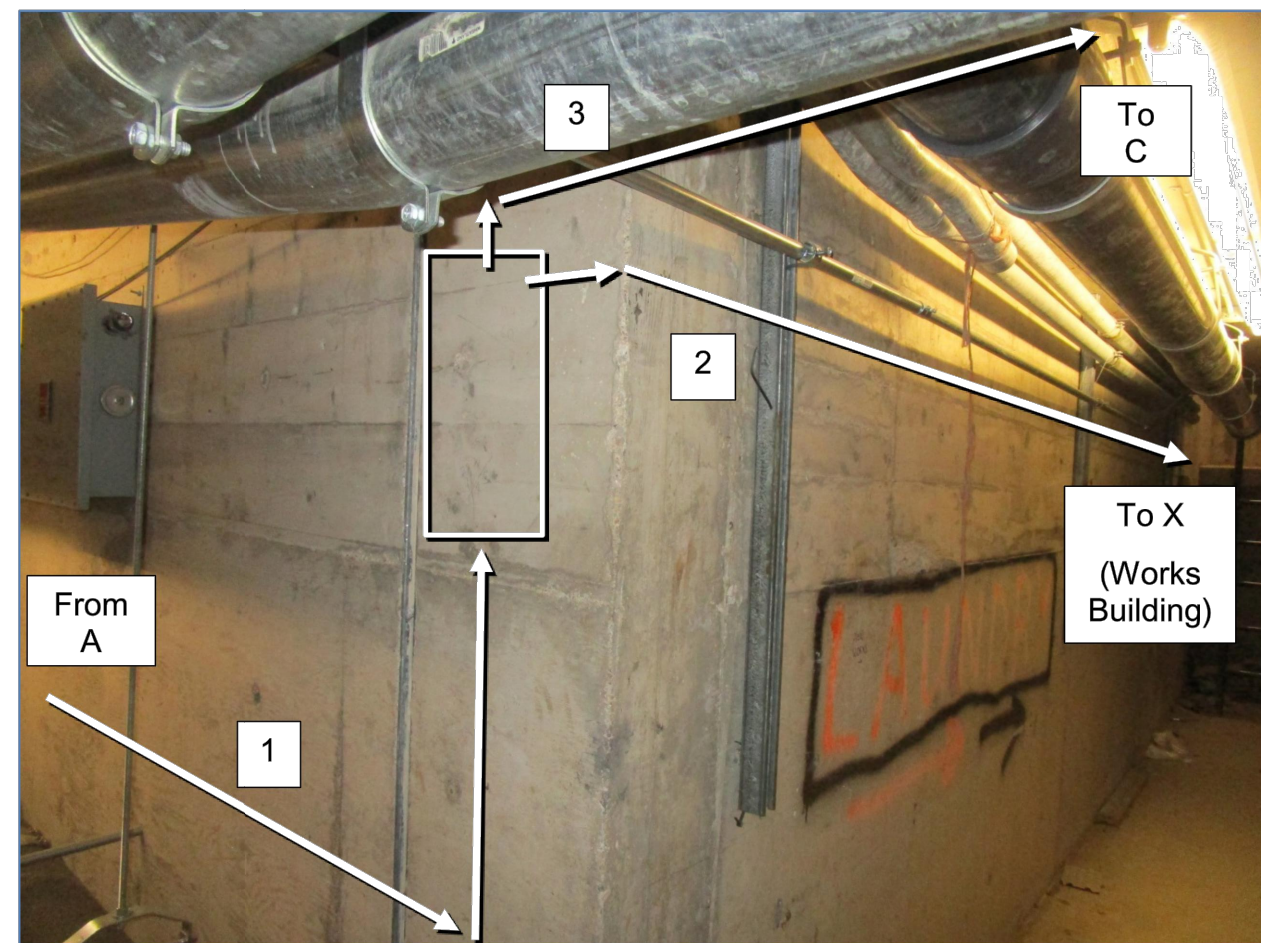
Location B, junction between conduit to Unit 6 and conduit to Works Building
